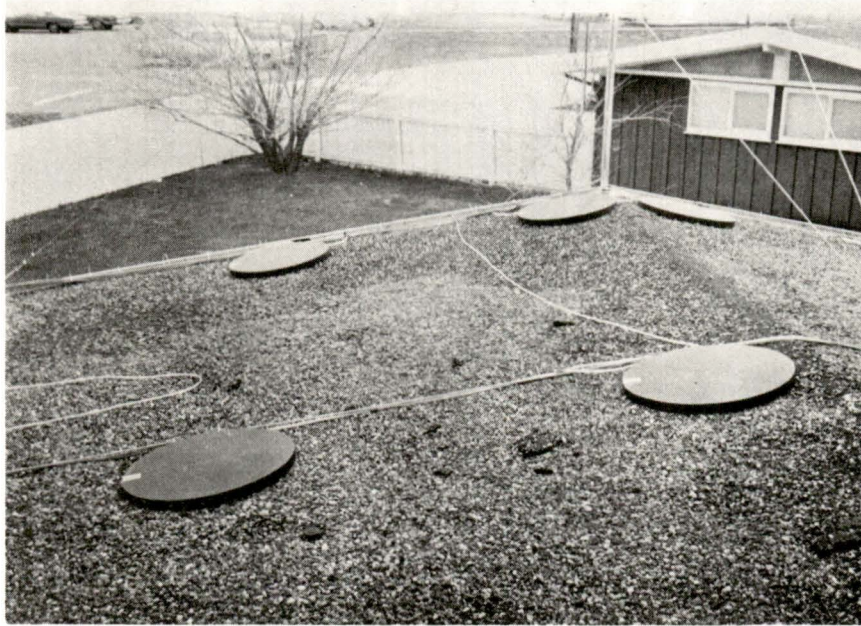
Transducers and aluminum housings installed on the roof of the prototype house
